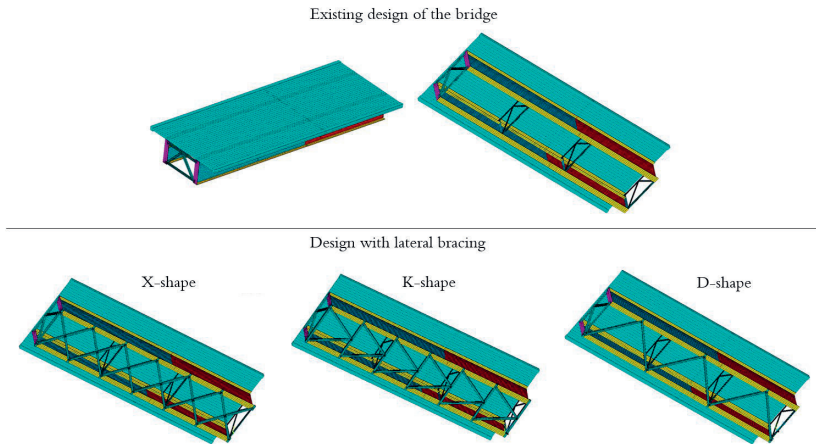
Segments of the modelled Pitsund Bridge, existing- and strengthened design.
